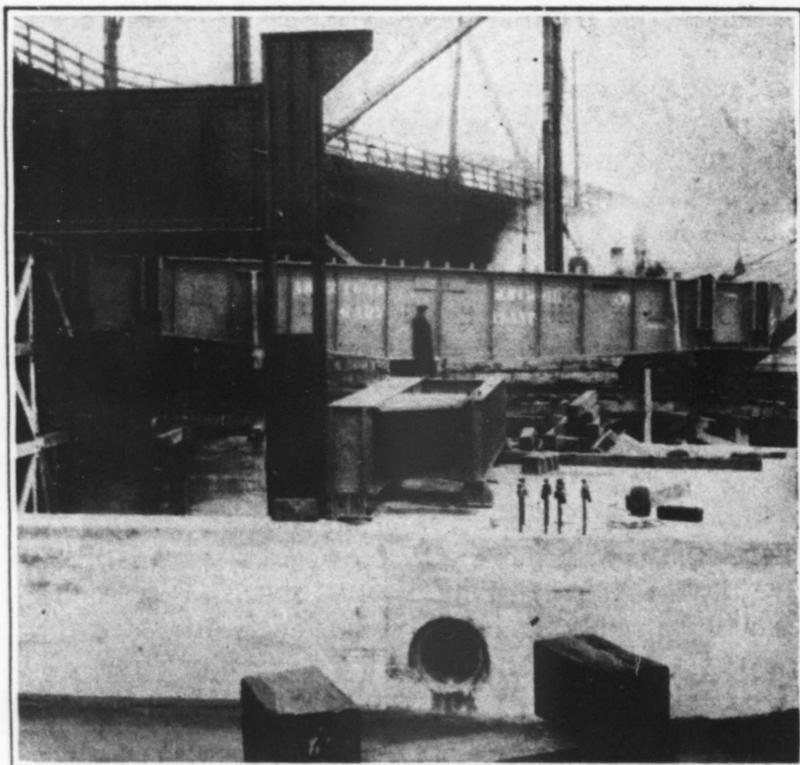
TRUNNION GIRDER MOUNTED ON TRUCKS
